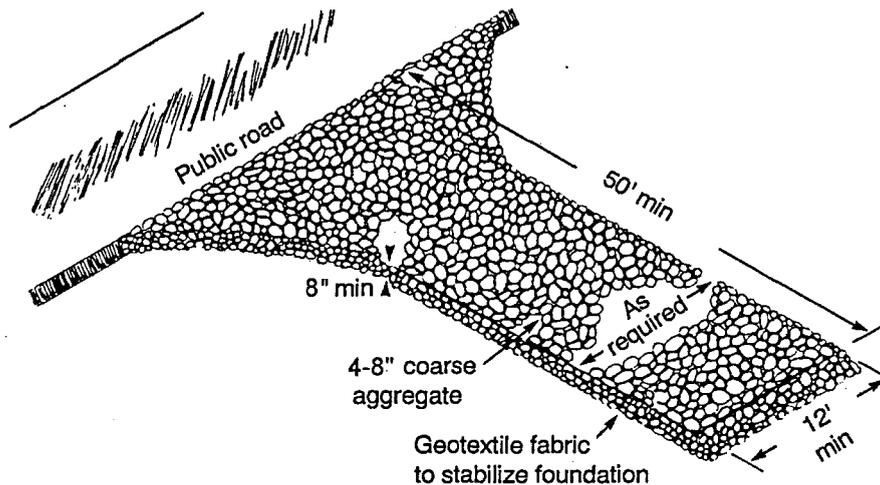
Schematic of Temporary Construction Entrance/Exit (after NC, 1993)
